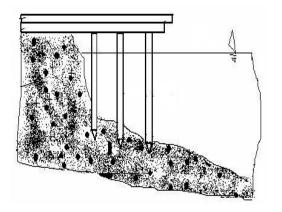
Coastline filling in deep seas with horizontal steel-concrete beams fixed on reinforced concrete stakes
